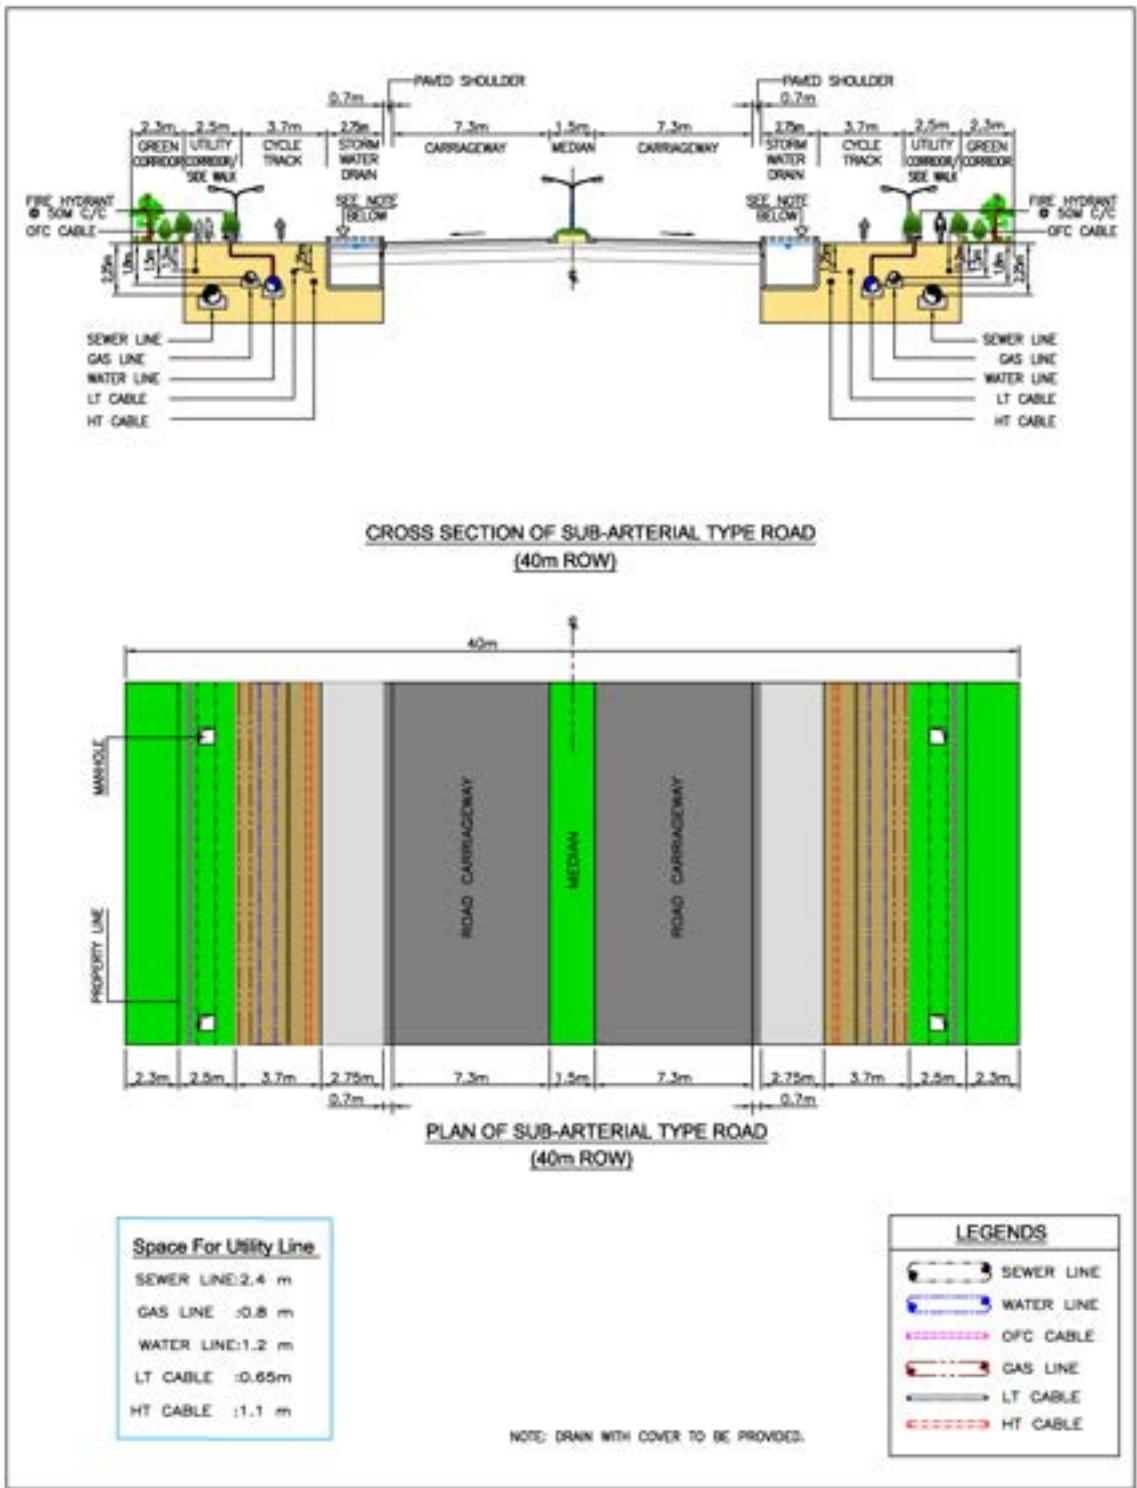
Cross Section and Plan of 40m ROW Sub-Arterial Type Road
